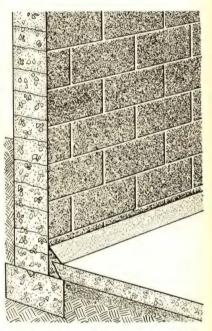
A Cement Cove Built Up at the Intersection of a Basement Floor and Wall
